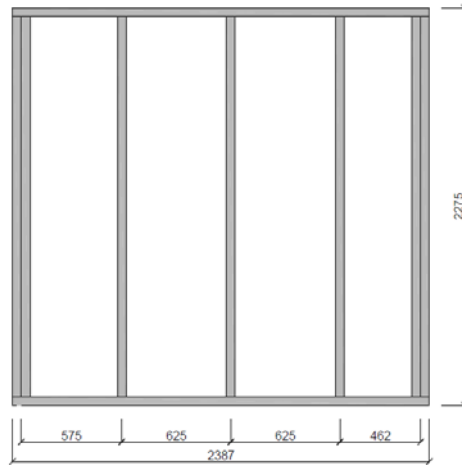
Steel frame for WS\_2400\_M, WS\_2400\_C and WF\_2400\_C specimens
